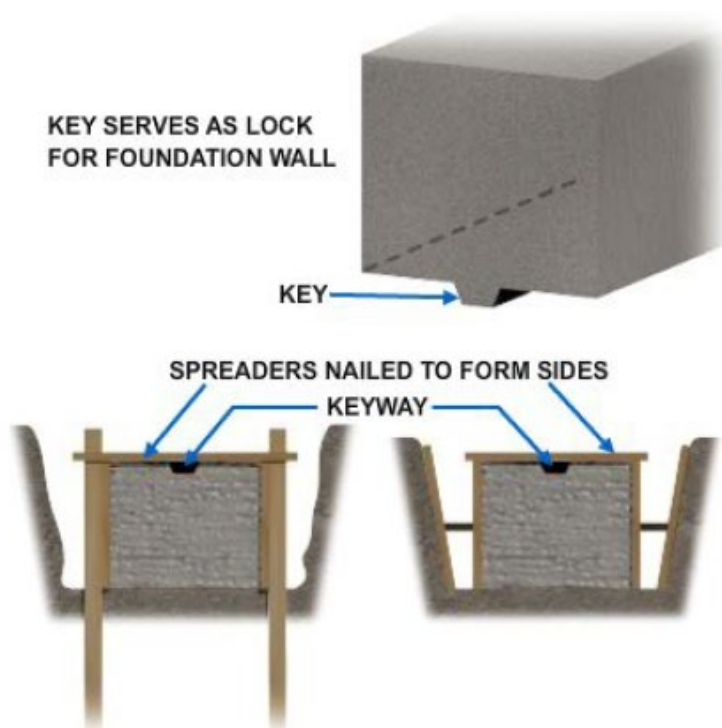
Methods of bracing bearing wall footing forms and placing a keyway.
